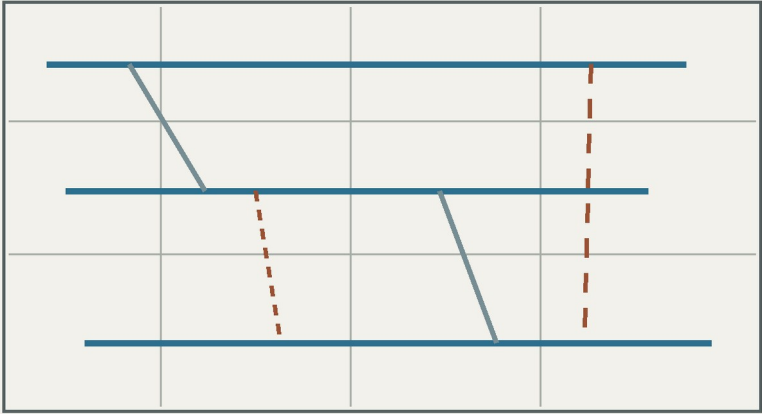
Reconstructed water-supply and drainage plan. Confirmed, reconstructed, and unconfirmed routes are identified separately.
